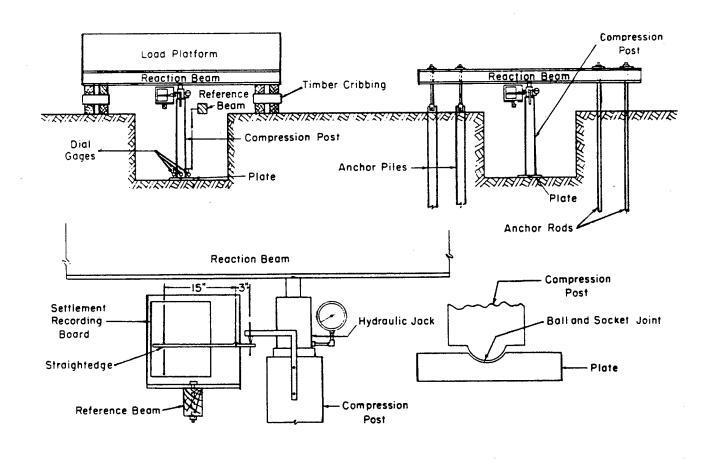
Typical Plate Load Test Set-Up. (After ASTM D 1194)
